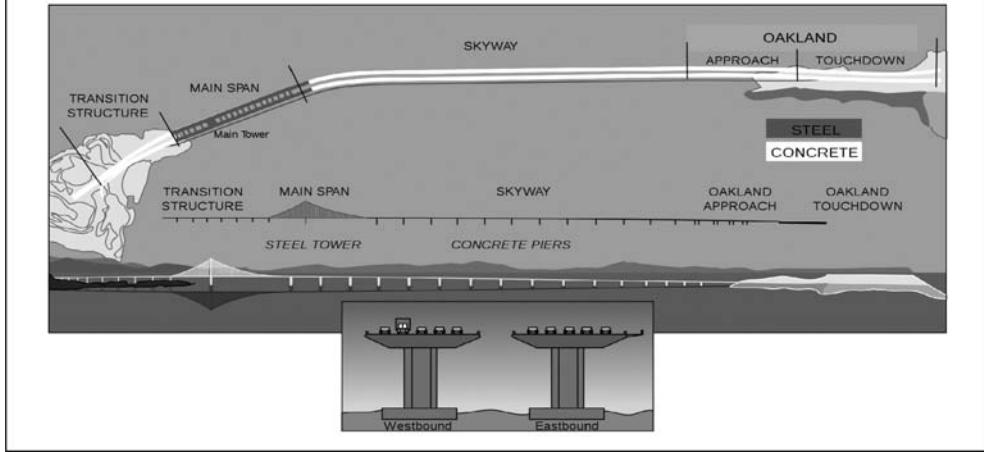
Schematic of the new East Span of the San Francisco Bay Bridge (<http://en.wikipedia.org/wiki/File:SFOBBEastSpan.svg>).
